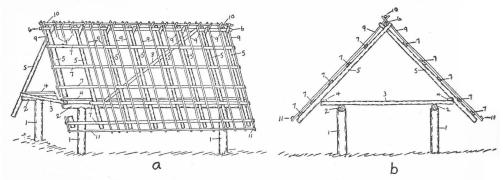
Roof framework of house: a, side view, left end near principal rafter, four thatch rafters and end of fourth purlin cut away to show underlying parts of frame; b, end view. 1, supporting posts (pou); 2, longitudinal beams (hapai); 3, crossbeams (vae); 4, wall plate (kaupapa); 5, principal rafters (oka); 6, main ridgepole (tauhuhu); 7, purlins (tarawa); 8, diagonal strut (toko) attached to main ridgepole above and to wall plate below, crossing four rafters to which it is also attached; 9, thatch rafters (whakakaho); 10, upper ridgepole (tauhuhu iti or takiri kaho); 11, eaves rod (turuturu iti).
